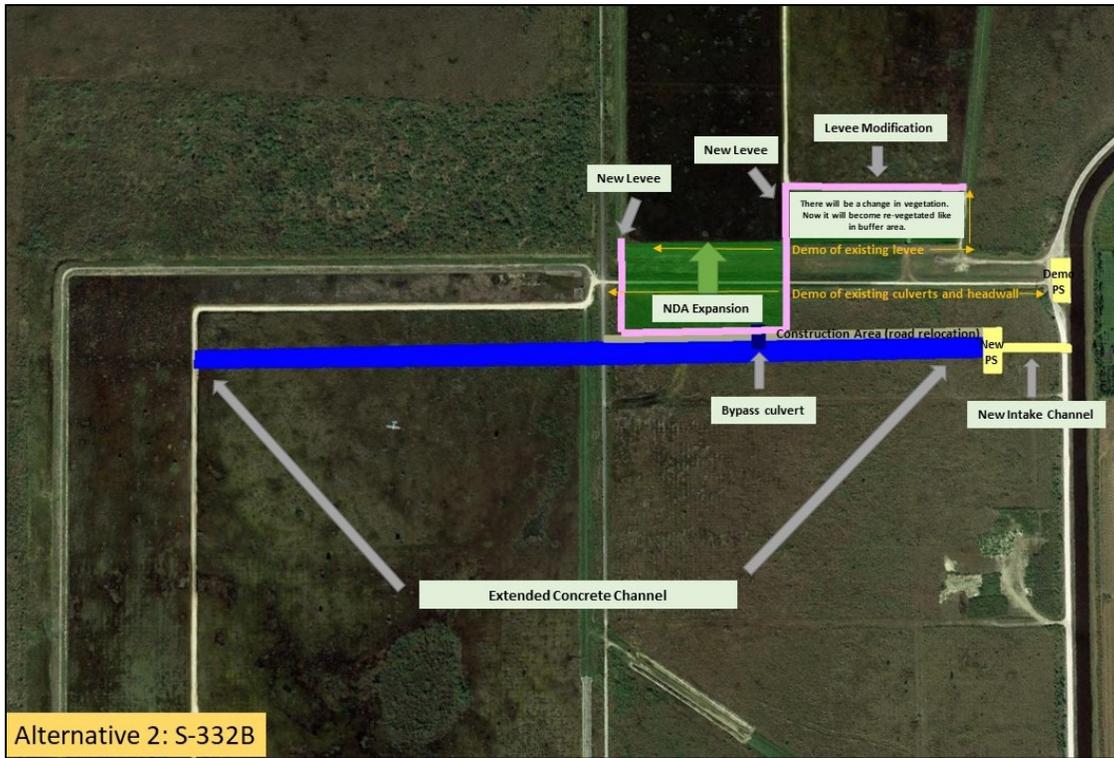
Alternative 2 Extended Concrete Channel project footprint.
